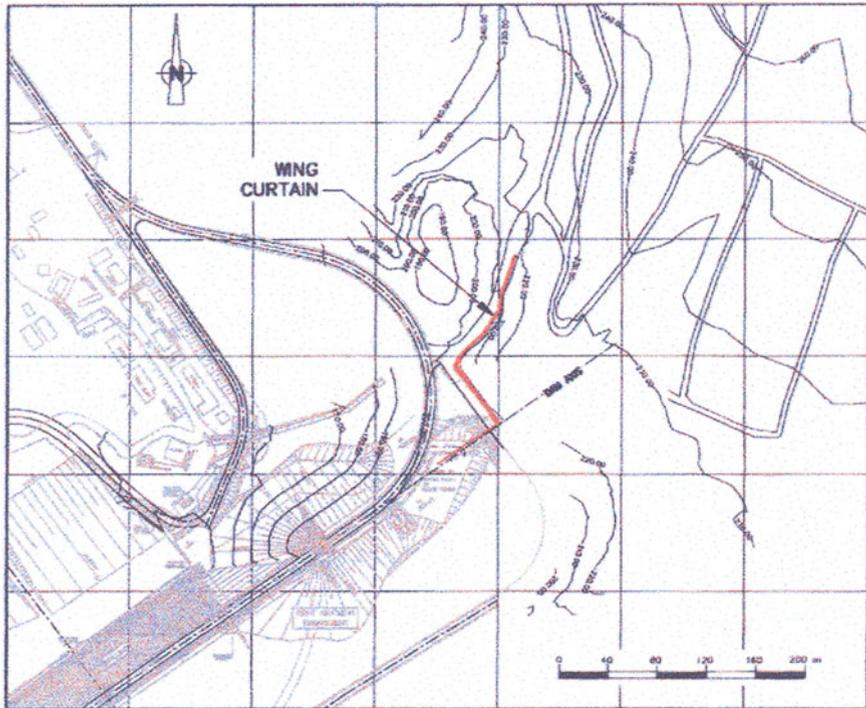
Mujib Dam. Layout of the grout curtain at the right abutment; in red: Wing Curtain
